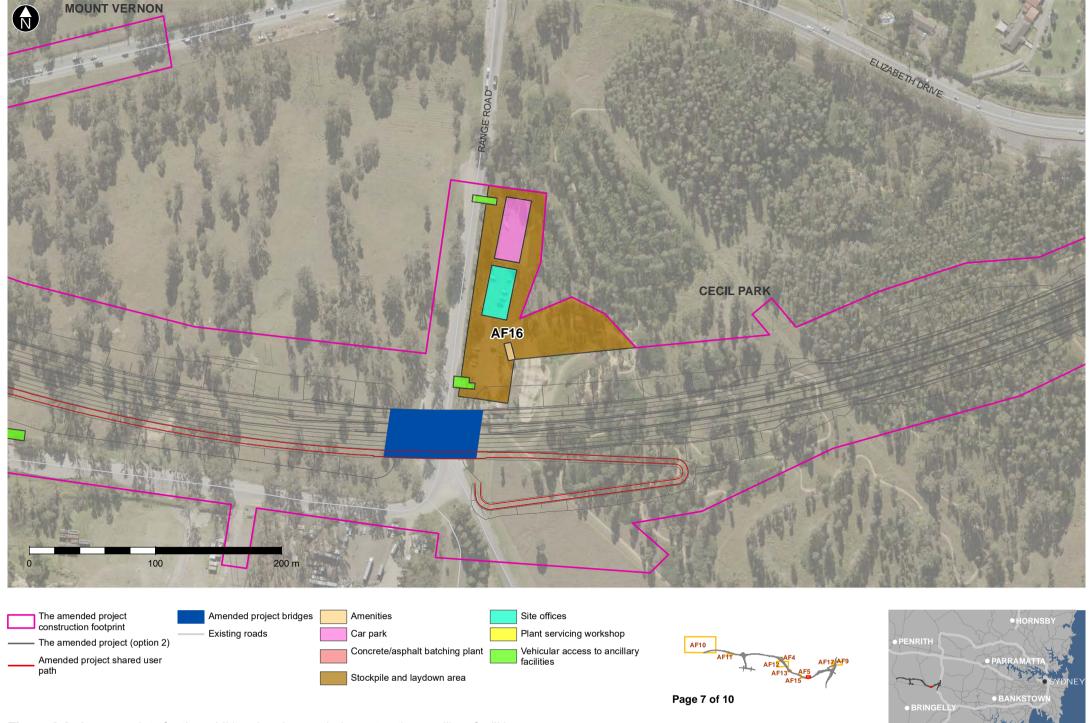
Access points for the additional and amended construction ancillary facilities
